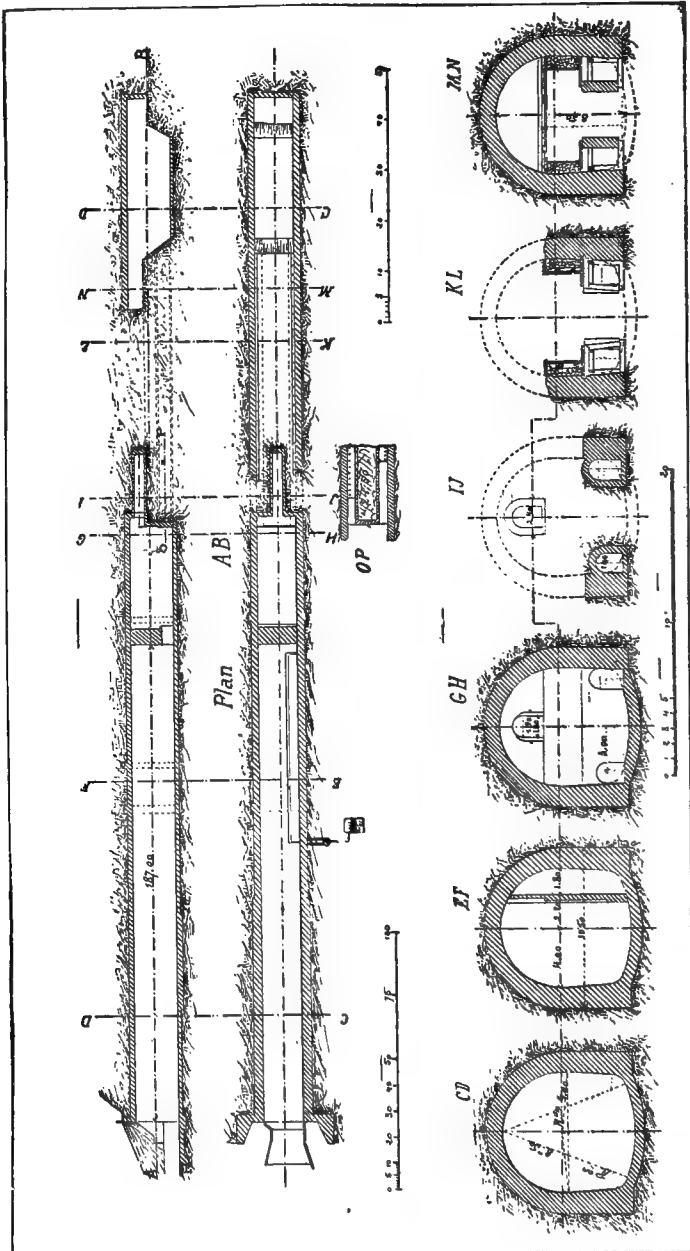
Details of the construction of the tunnel. Longitudinal section along the axis A B of the tunnel. Horizontal section plans along A B and O P. Cross sections C D, E F, G H, I J, K L, M N.
